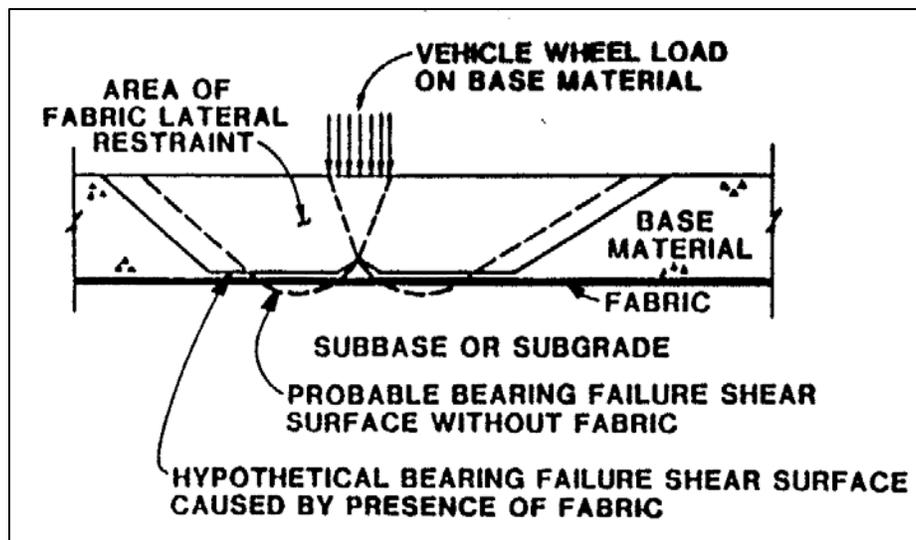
Shear Failure Mechanism With and Without Geotextile
